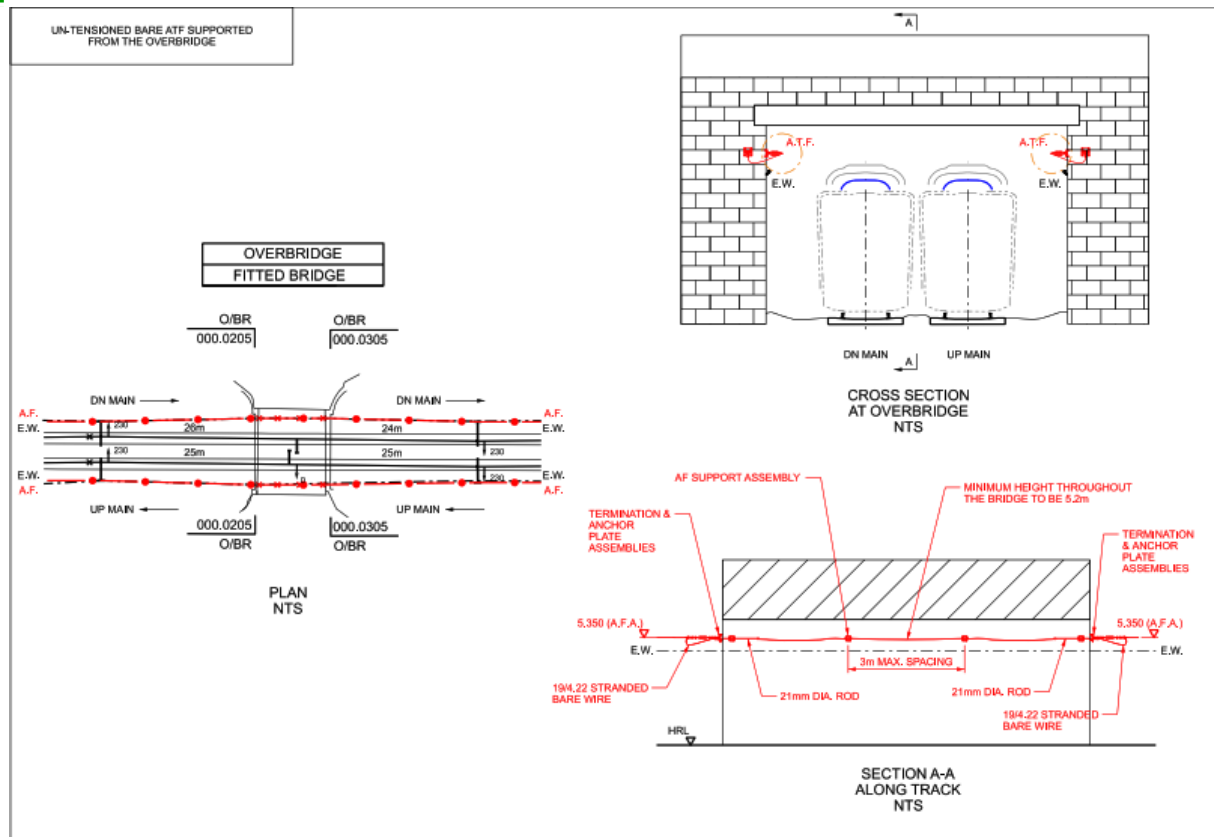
Example of bare ATF fitted to the overline structure un-tensioned
